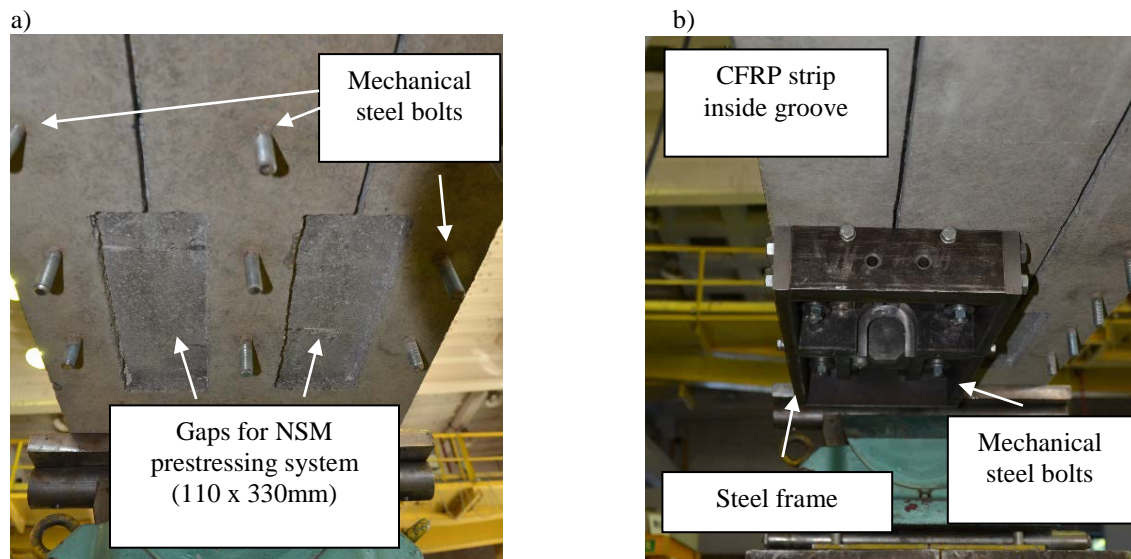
Strengthening of series B specimens: (a) View on the bottom of beam of NSM12B before CFRP strips installation, (b) Frame of NSM prestressing system mounted on the bottom of the beam.
